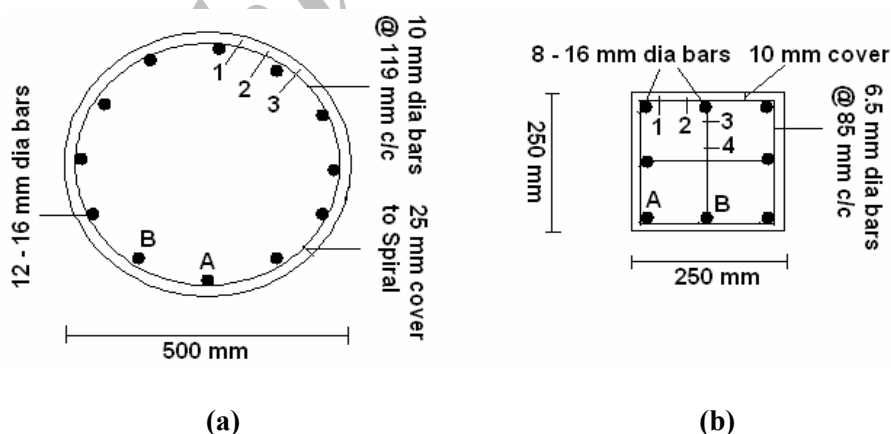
Geometry and reinforcement arrangement for (a) M4 (b) CS17
